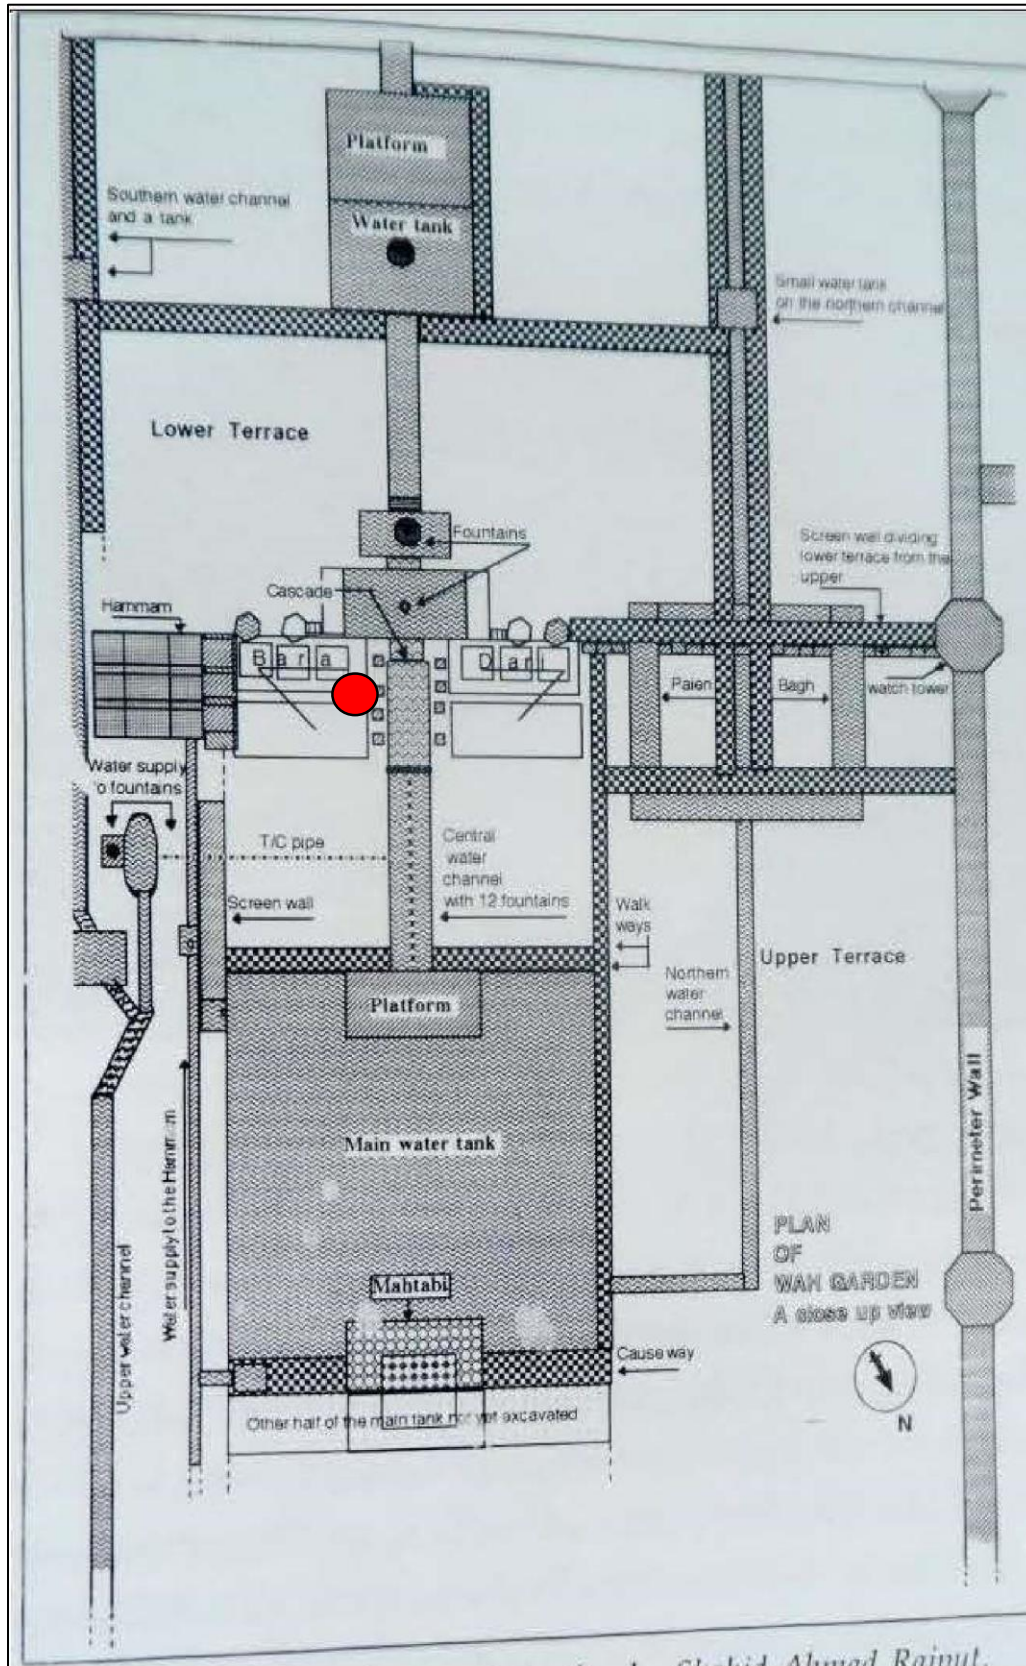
Wah Gardens, Hasanabdal: Layout Plan and sampling area (encircled) (After Rajput, 1996)
